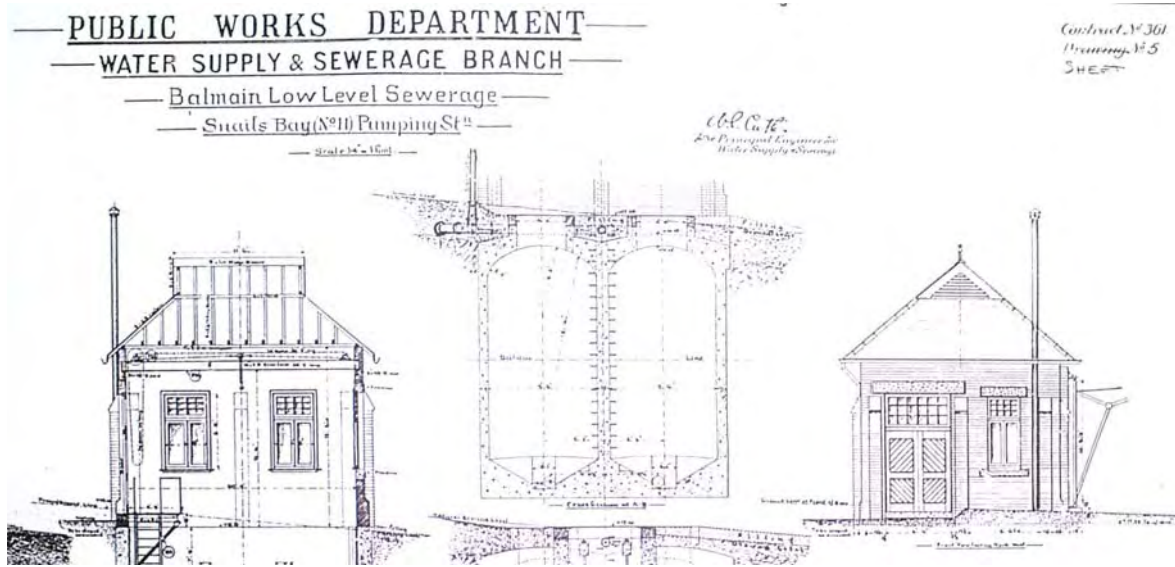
Plan of the Balmain Low Level Sewerage Pumping Station at Snails Bay, dated 5 Dec. 1902, which was installed in the south-east corner of the Park.
